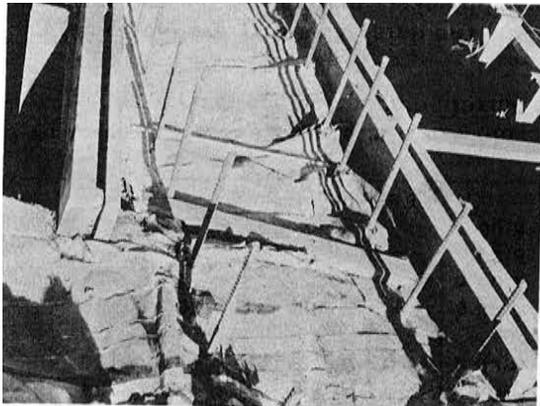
Spun glass insulation blankets are easily cut to fit special shapes such as this sluice pier at Kirwin Dam. Reinforcement steel was punched through blankets which fit snugly around bars.
